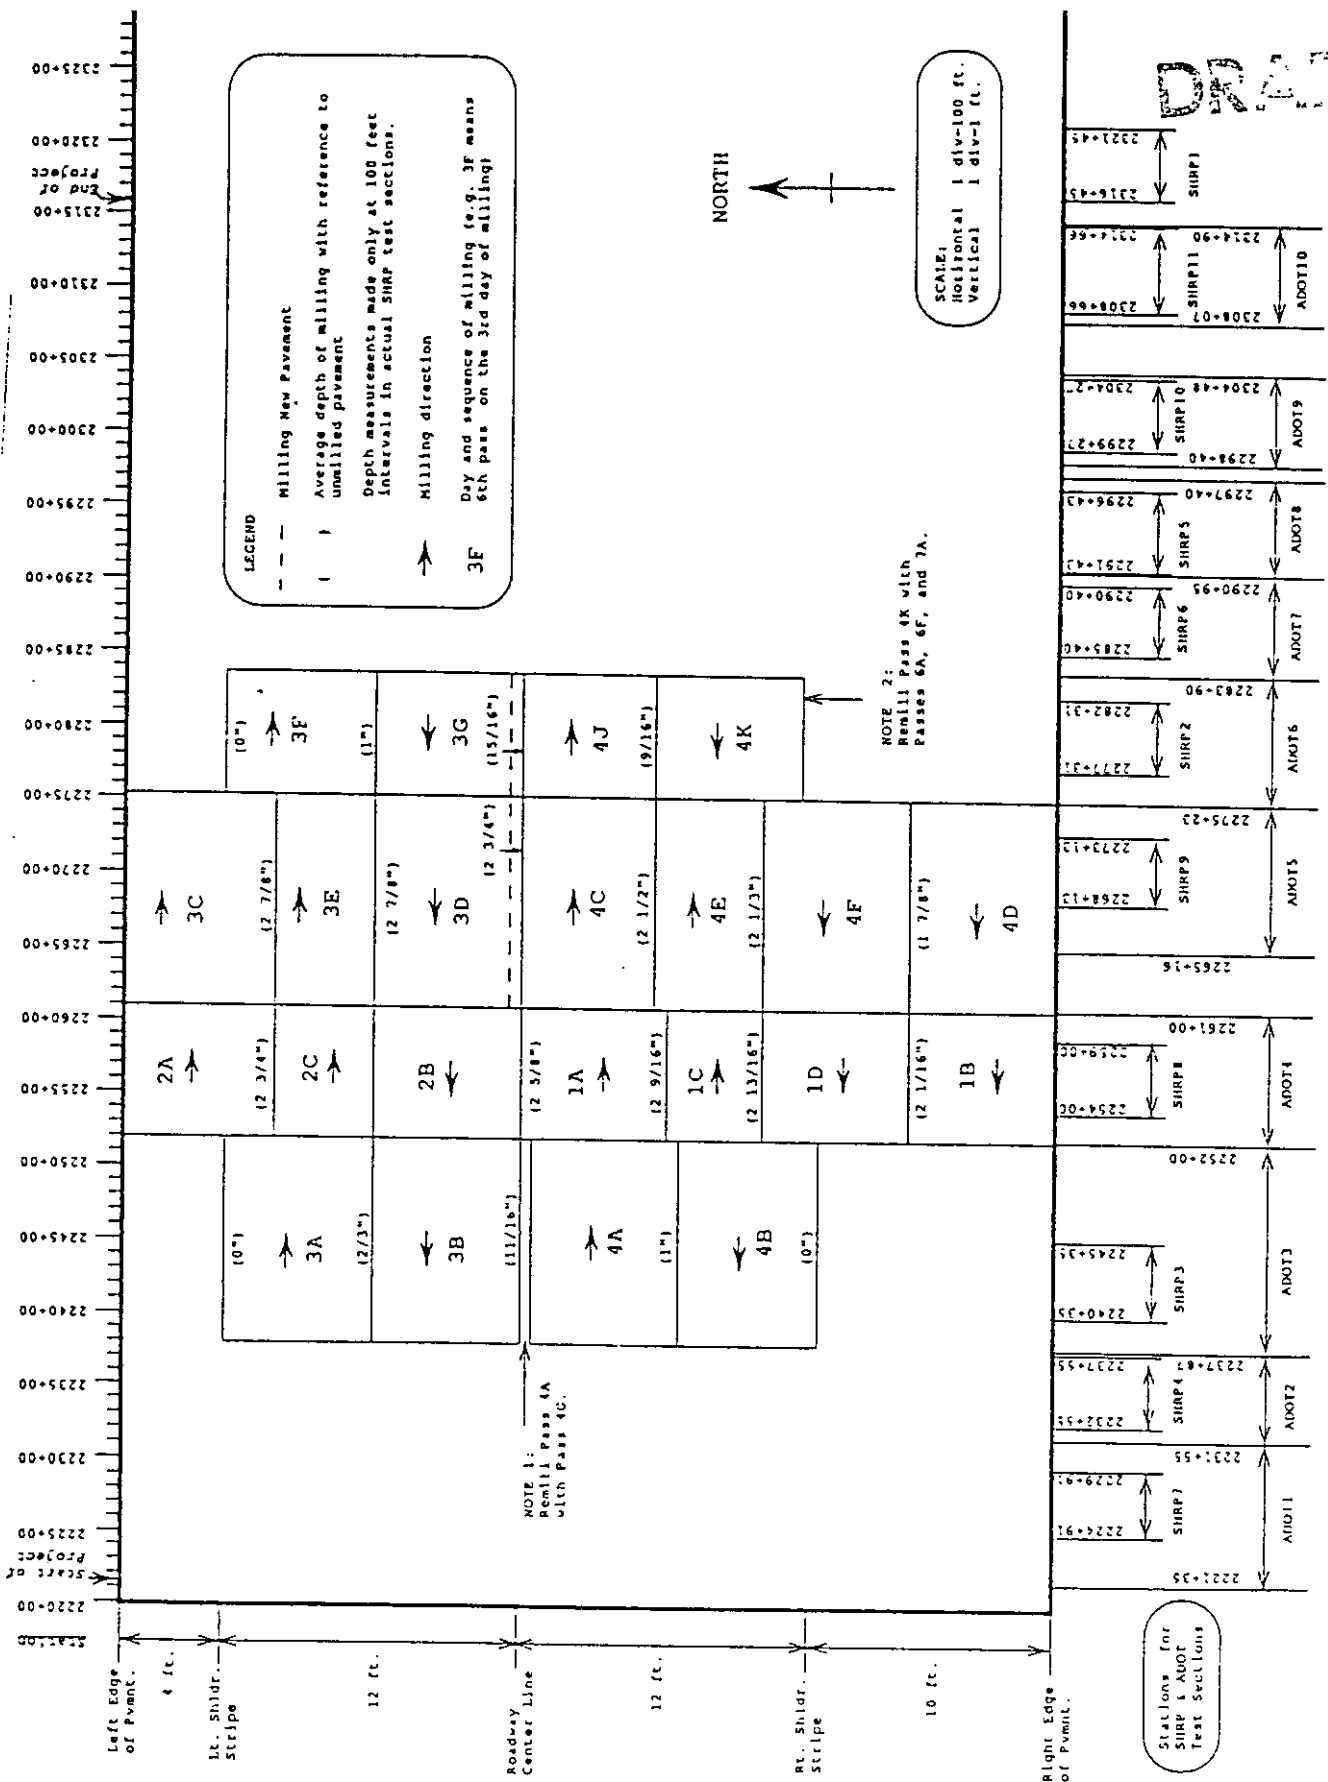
Milling Plan for Sections 3, 4, 5 and 6.
